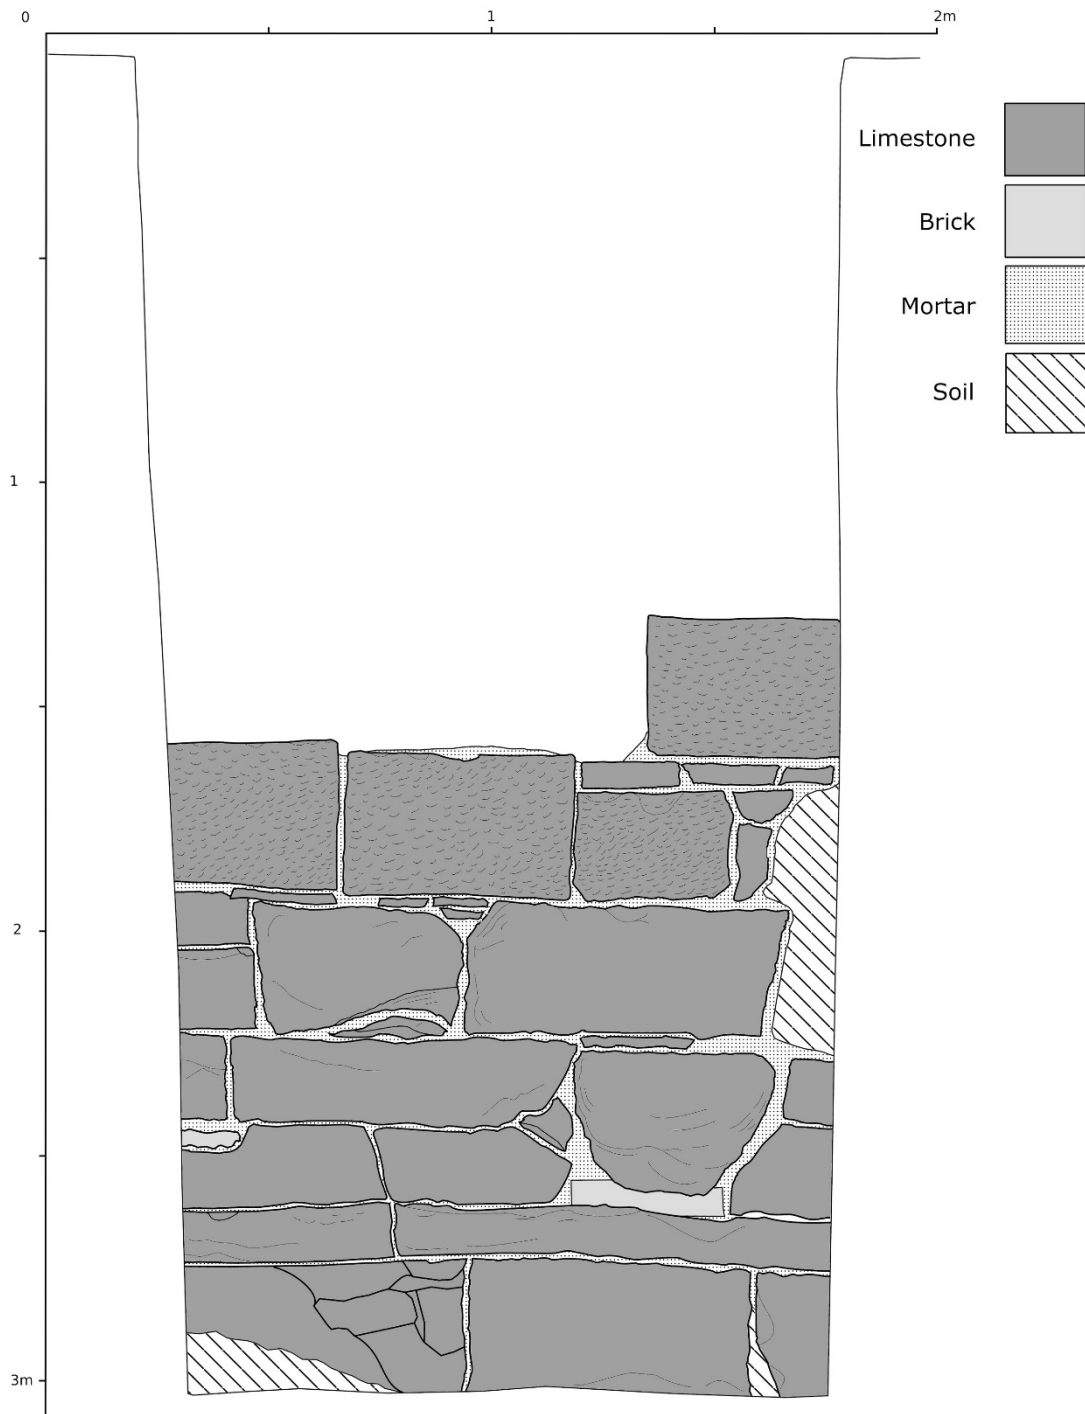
Elevation drawing of southwest face of wall C5-3-13.
